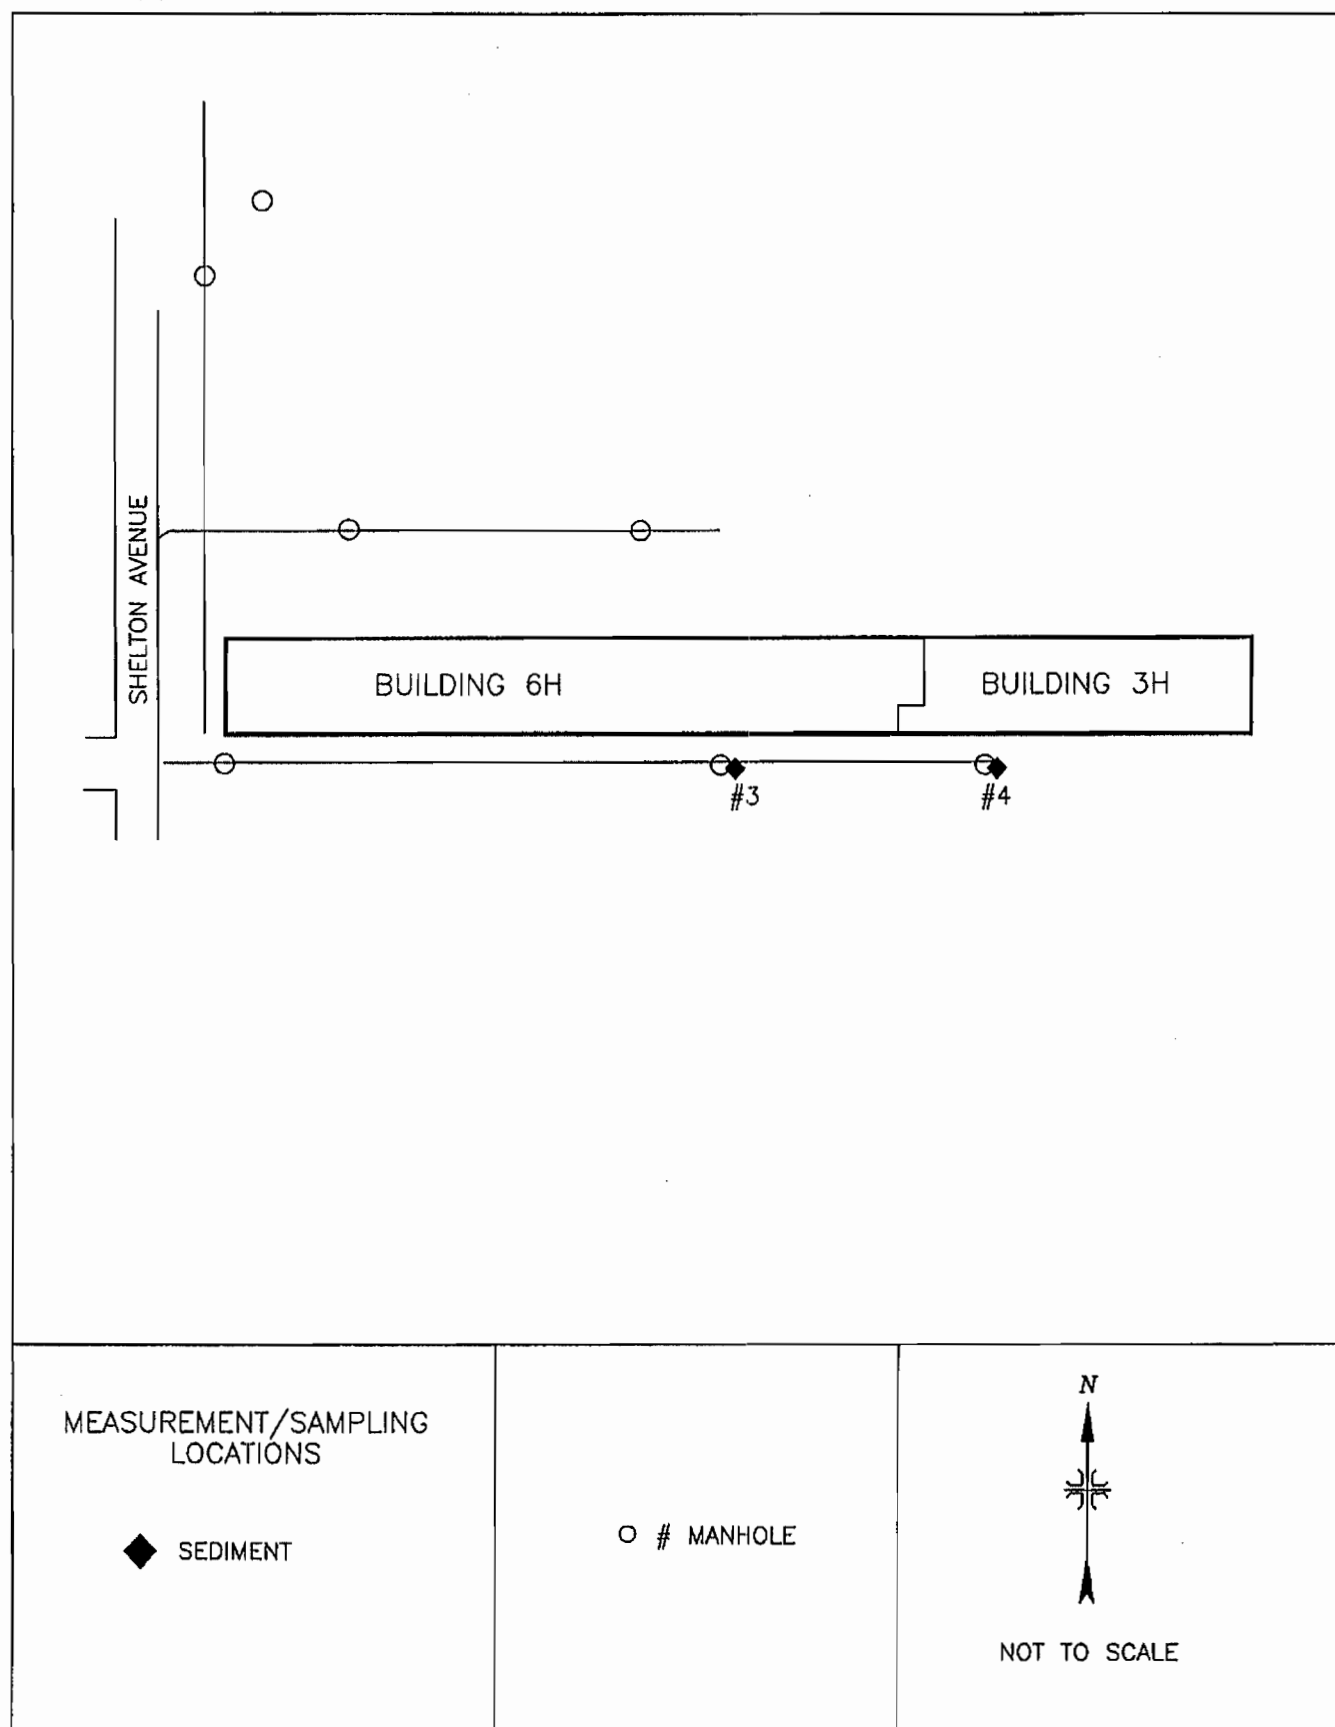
Layout of Storm/Sewer System – Sampling Locations
